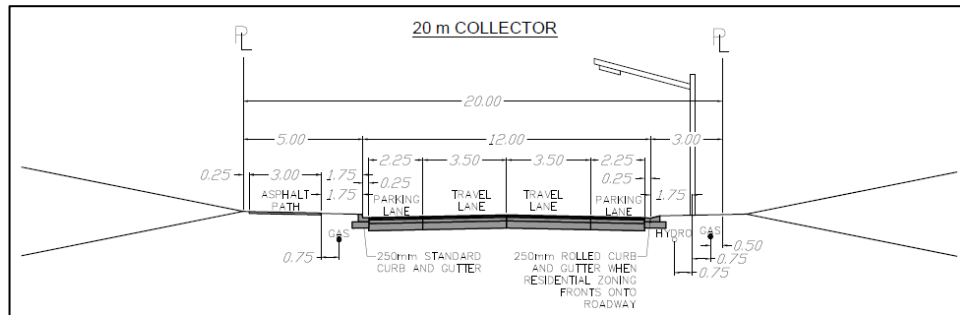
20 m Collector Sample Cross Section (source: Arcadis IBI Group FSR)
